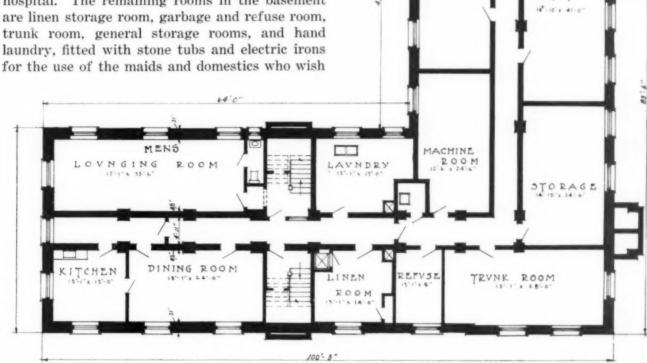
Grace Hospital-Basement plan of employees' service building.
